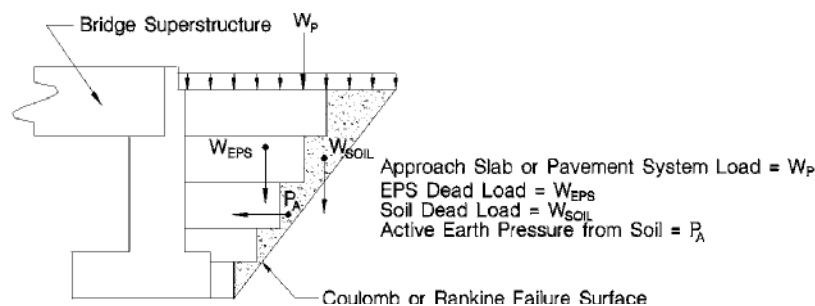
Loads on an EPS-block geofoam bridge approach system.
